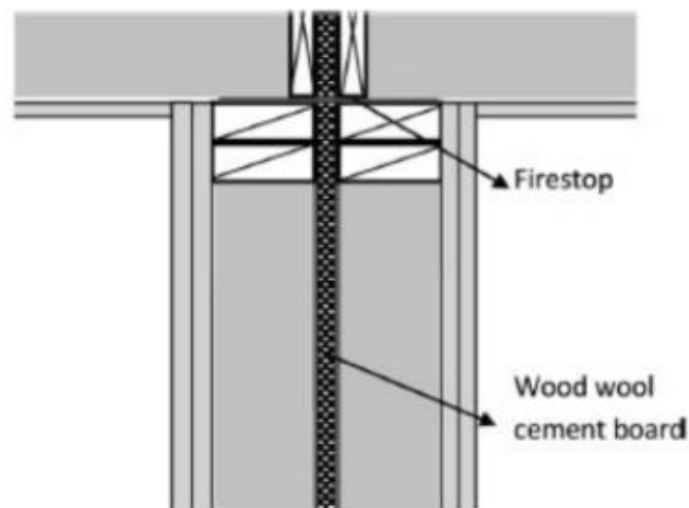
Fire safe wall and floor construction for terraced TFC constructions up to three stories (Hens, 2013)
